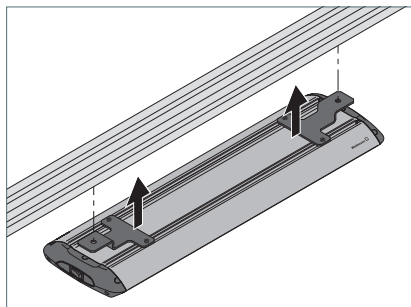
Mounting the luminaire of mounting type "Top, fixed", 1st option.
